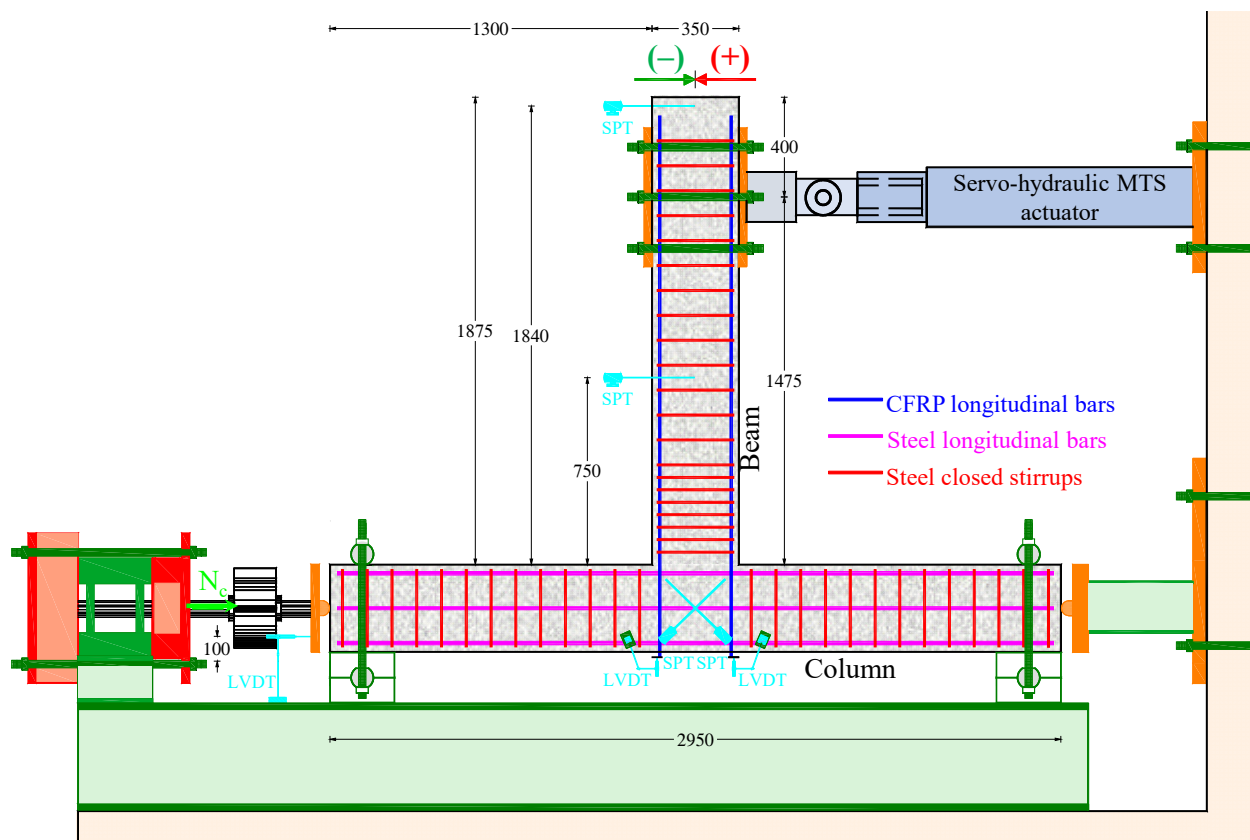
Schematic drawing of the test setup, geometry and reinforcement of the beam-column joint specimens subjected to cyclic reversal deformations (dimensions in mm).
